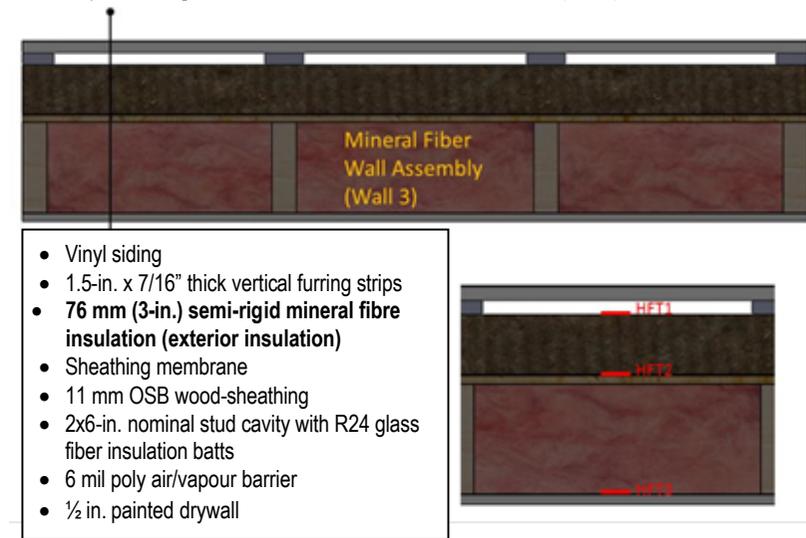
Wall 3 (W3: MF) - Horizontal cross-section through mineral fibre (MF) wall assembly showing locations of HFT
